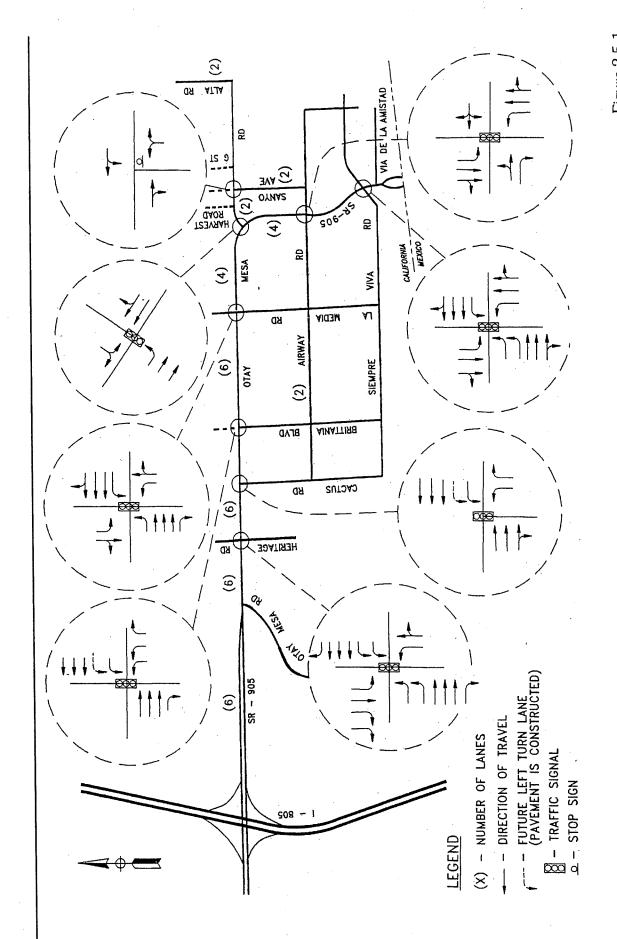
EXISTING ROADWAY CONDITIONS DIAGRAM
